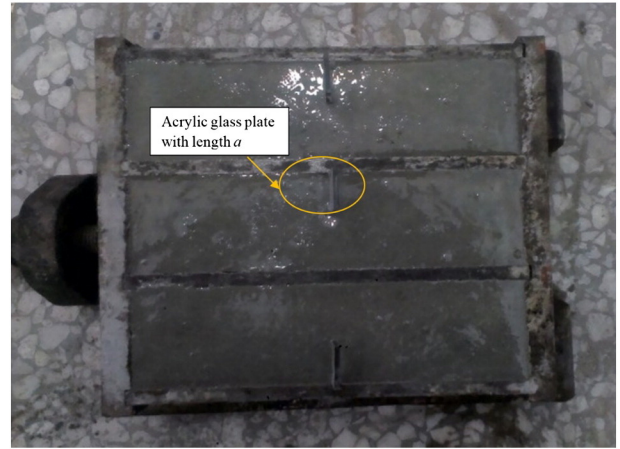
Specimen preparation using iron mold and acrylic glass plate.
